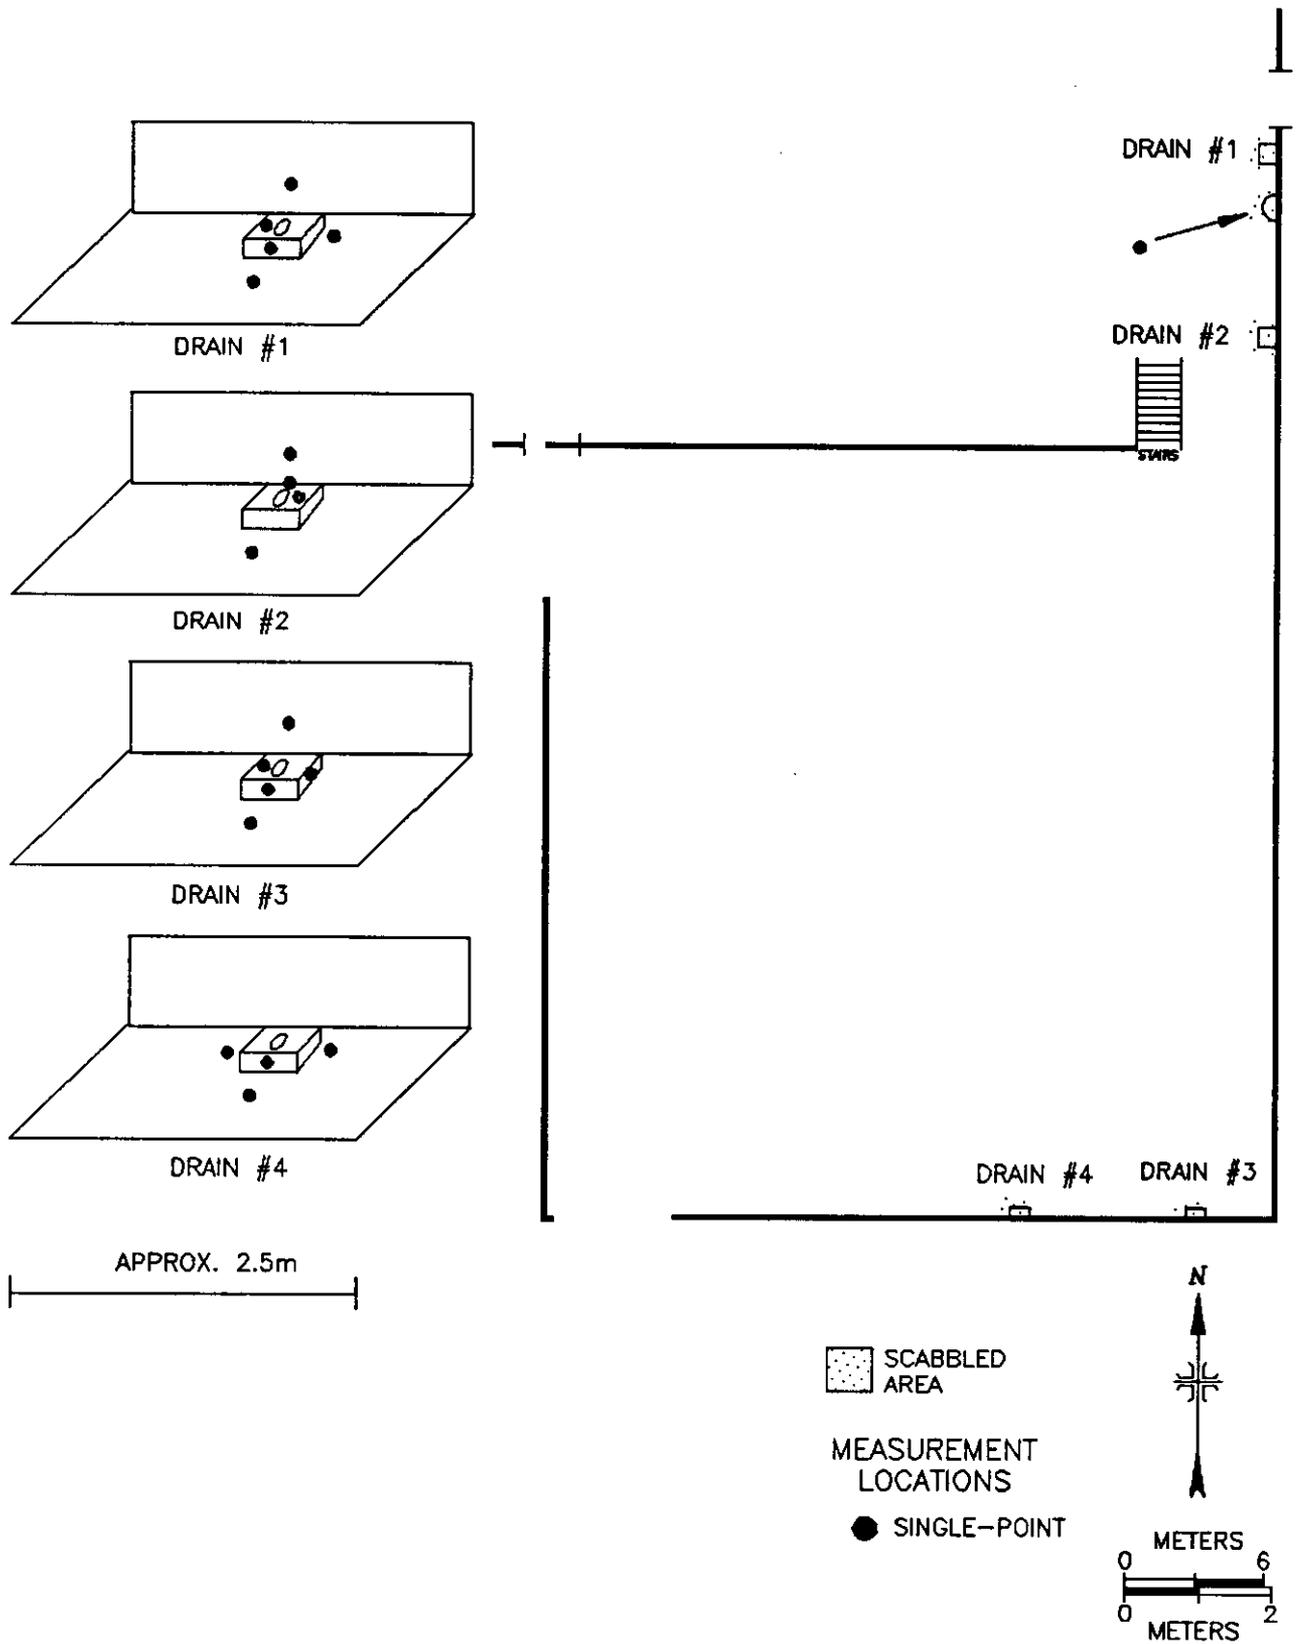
Building 29, Room 111, Indicating Measurement Locations on the Floor and Drain Pedestals
